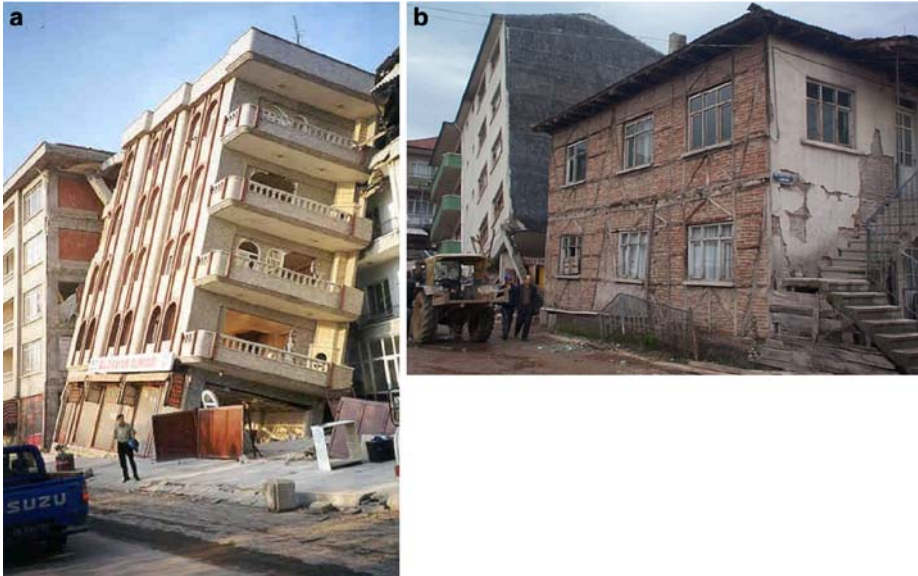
Four to seven storey concrete frames buildings with infill masonry predominated in the main towns of the affected area (a). This one, in Adapazari, was destroyed by foundation failure. These are mixed with older masonry buildings of two or three storeys (b), some with timber floor and roof structures and sometimes timber lacing in the walls (Photos: (a) Matthew Free, (b) Dina D' Ayala reprinted courtesy of the Earthquake Engineering Field Investigation Team EEFIT, UK)
